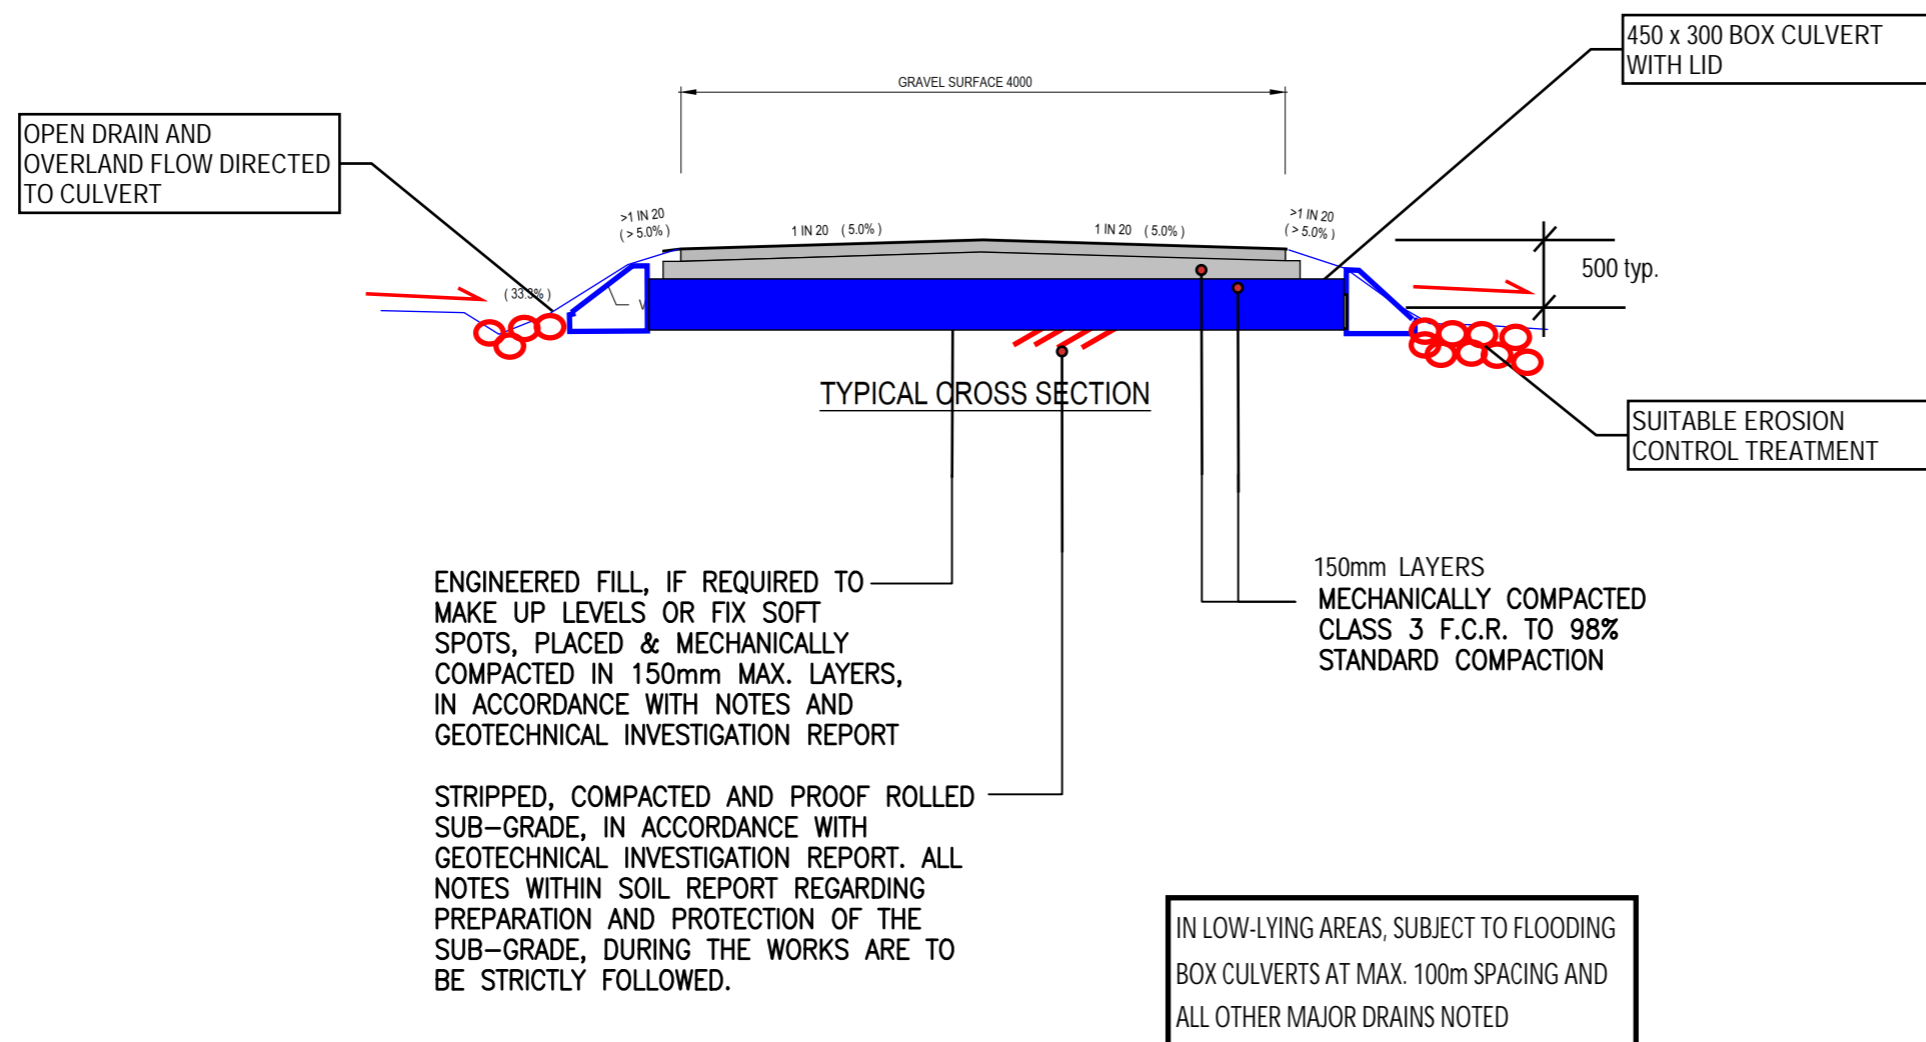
TYPICAL LOW FORMATION DRAINAGE DETAIL
